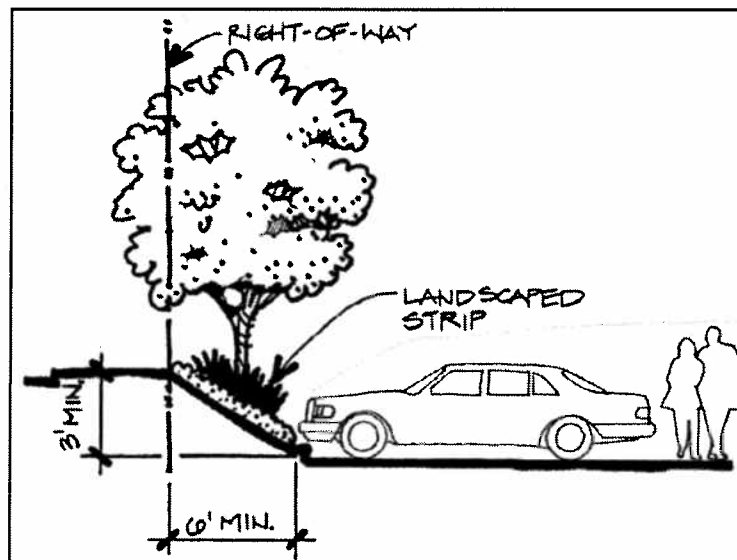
Parking Lot Landscaped Strip, Option 3
